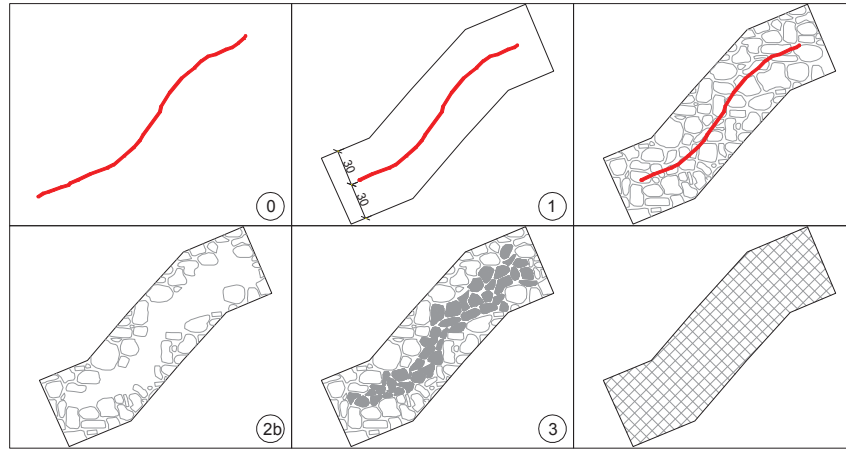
Example of local retrofit intervention of significant cracks on masonry walls.
